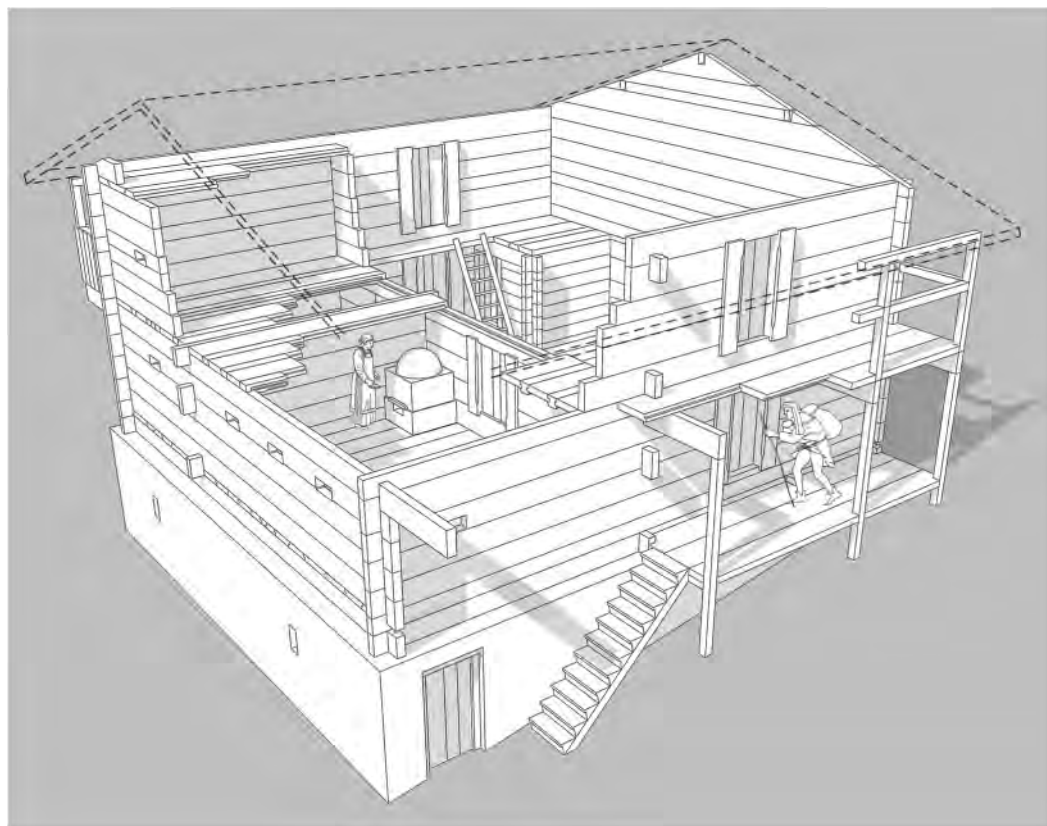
Perspective reconstruction of the house Gütschweg 11 (dated 1311) in Schwyz, Canton Schwyz, Switzerland. Only individual beams of the inner walls penetrate the outer wall of the log construction. In addition, the floor and ceiling planks are visible on the façades (reconstruction by U. Gollnick and P. Frey, 2016).
